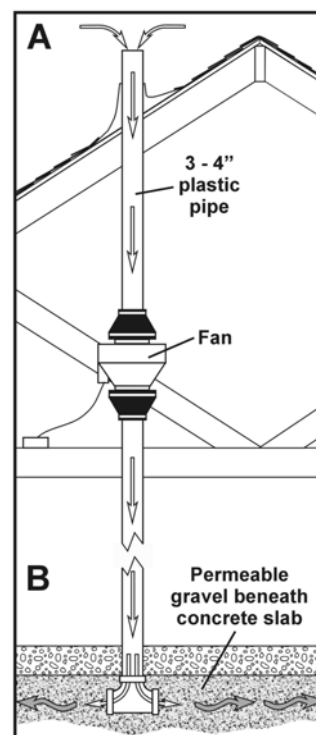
Reverse radon system. Air (white arrows) is pumped into a pipe at the top of a building (A) and forced into the soil beneath the basement foundation (B).
